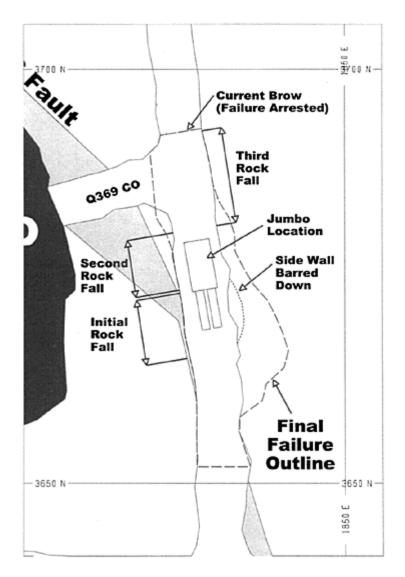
20B Sublevel mine plan showing details of the sequence of failures and final failure outline. The grey shaded area represents the floor projection of the J46 fault.
